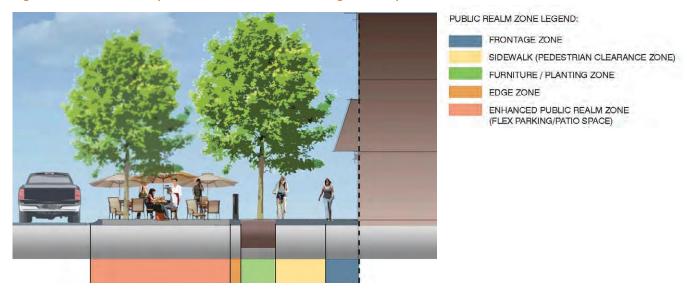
Streetscape Zones with Flexible Parking/ Patio Space
